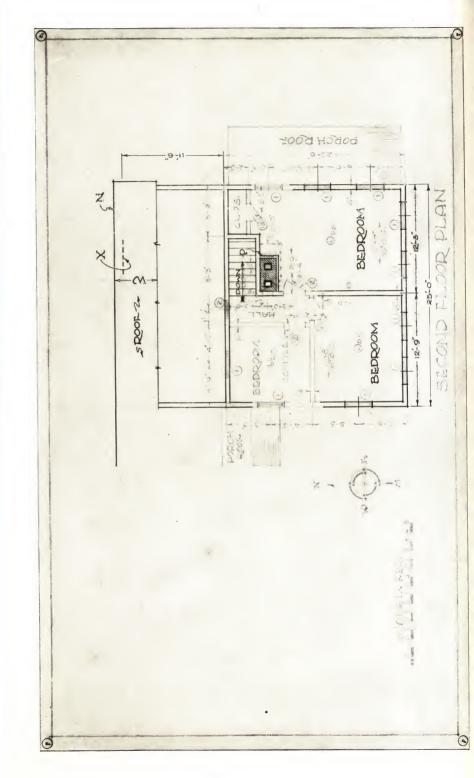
Step 2 in Drawing Remodeling Plans for Second Floor
